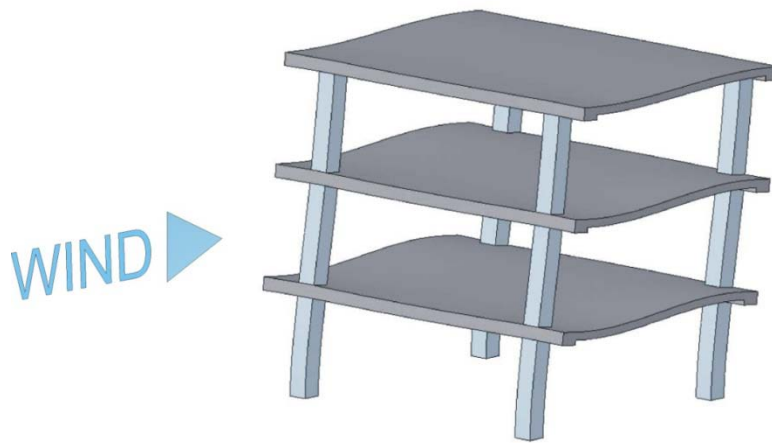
Horizontal movement of building structure. Frame is generally more flexible than walls.
